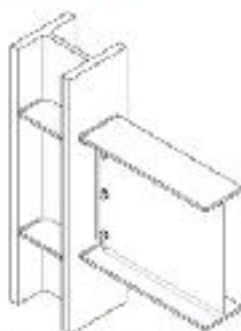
Welded stiffened flange-welded web (WJF-W) connection.
